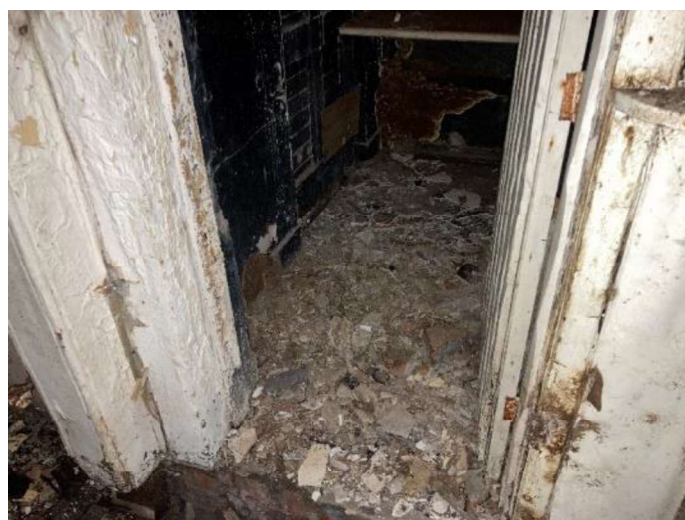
Severe deterioration of internal timber door and frame, Building 3, ground floor.
